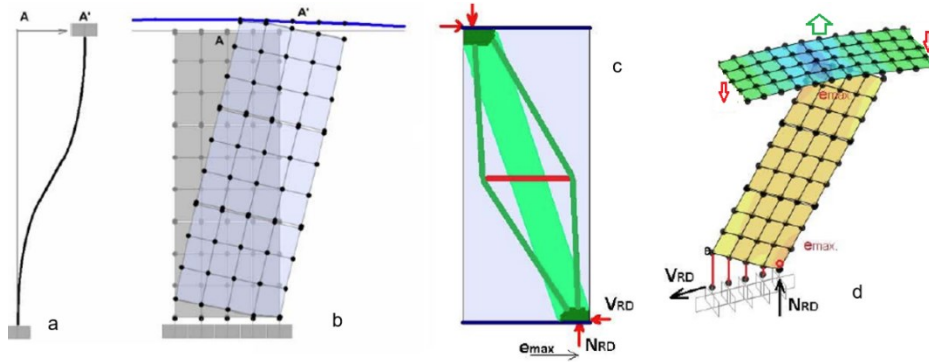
Columns/wall model, compressed diagonal, uplifting/increasing wall force
